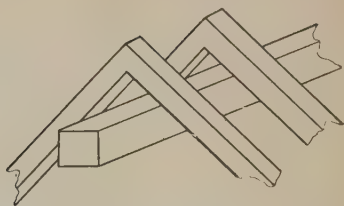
Faulty ridge construction. Rats can nest in the space between the roof-tree and the rafters when breadth of roof-tree exceeds 5 cm.
